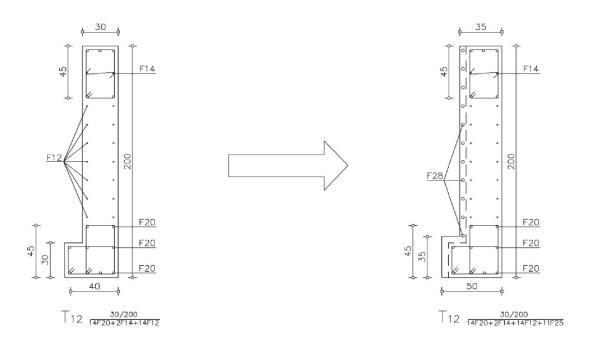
T12 Column Cross Section Area-Before and After the Strengthening
